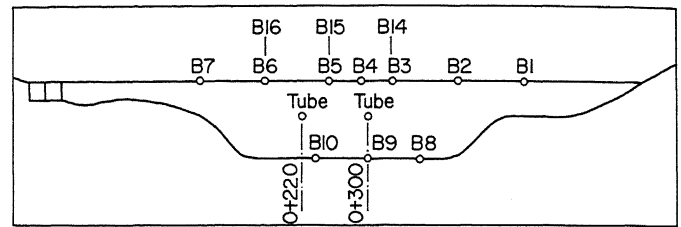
Longitudinal section showing locations of benchmarks and settlement tubes
